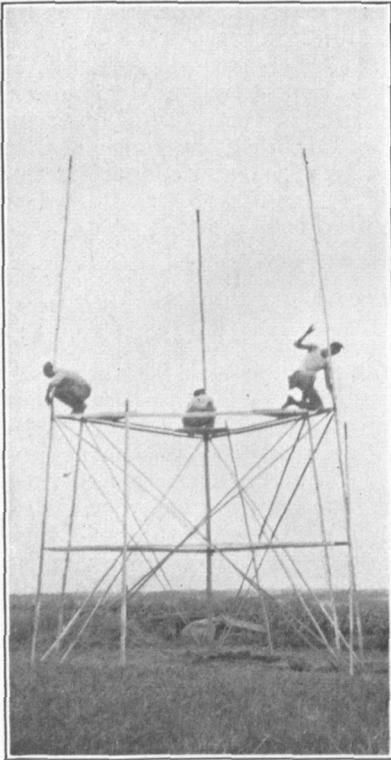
Lower section of tower completed, corner posts being bolted on for second section
